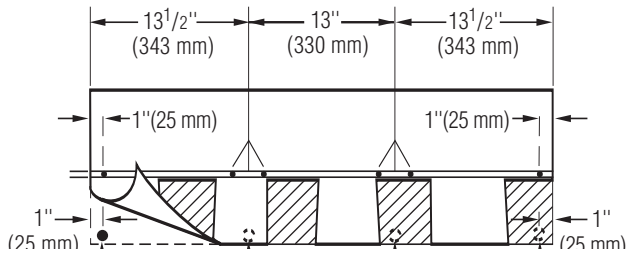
Use six nails and four spots of asphalt roofing cement on steep slopes.
